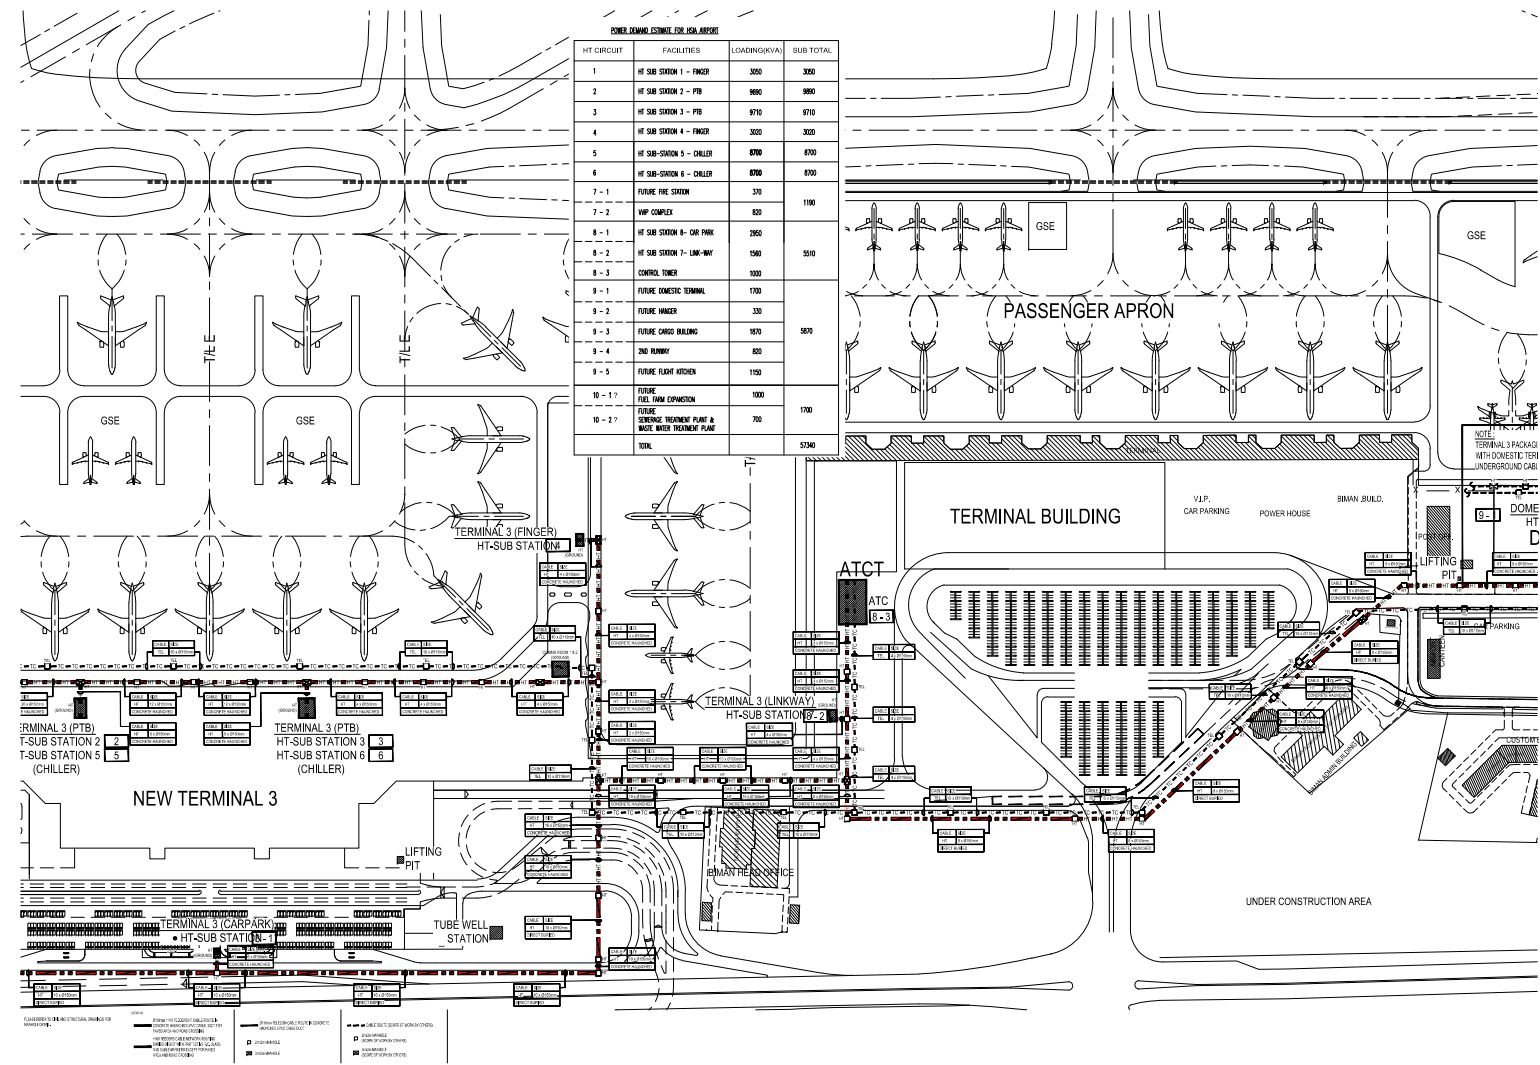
Substation and Power Cable Routing Layout No. 1
